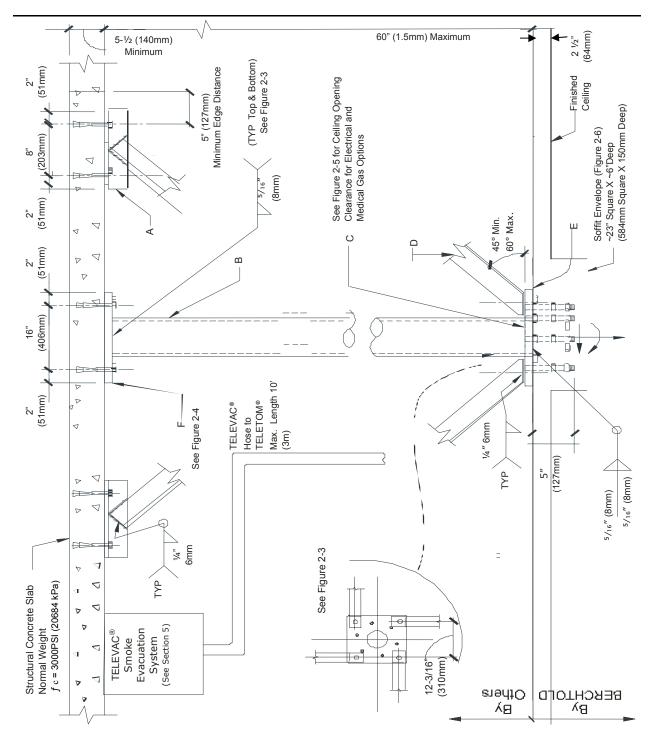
Recommended Super Structure Design and Construction Materials for TELETOM® Units with Light(s) or Monitor Arm(s)
